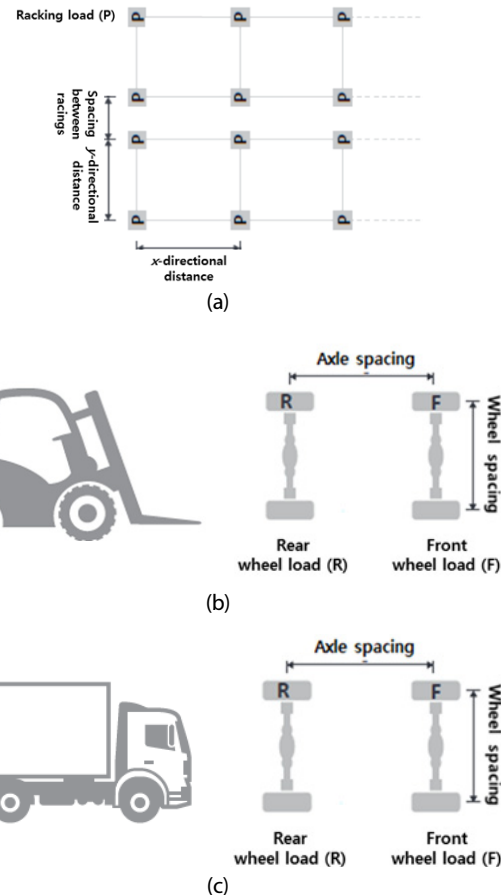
Design loads for the fiber-reinforced concrete floor slab; (a) racking, (b) forklift, and (c) truck loads
